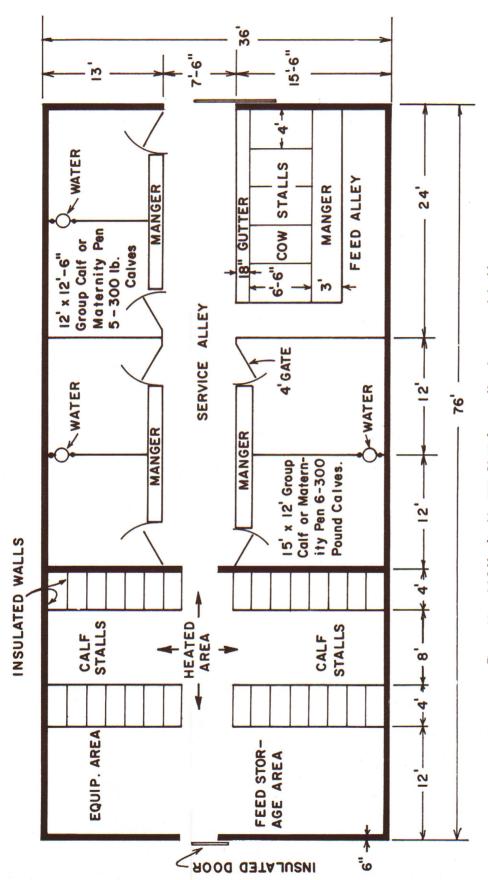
M.S.U. plan No. 732-CI-19 for a calf and youngstock building.
